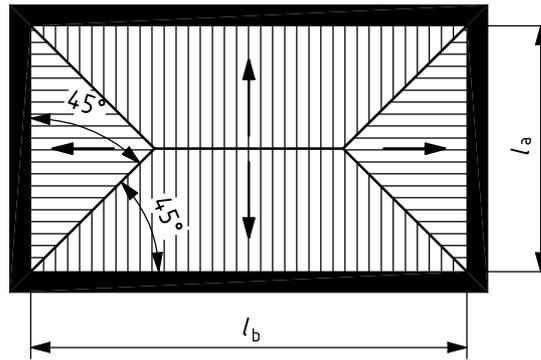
Tributary areas for minimum shear at the supports of two-way slabs supported on girders, beams or structural concrete walls
